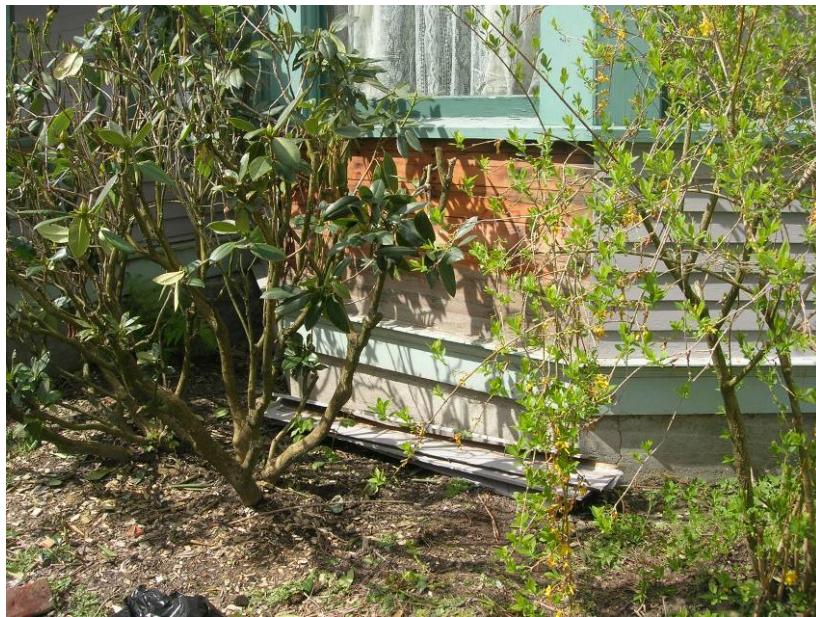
Smith House, Opening No. 4. North exterior wall behind siding.
